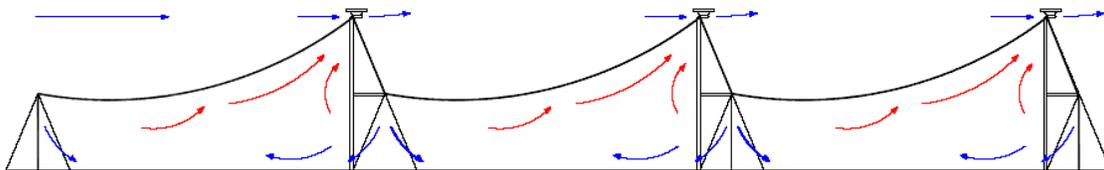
The long section of Hall 26, Hanover Fair, Germany
